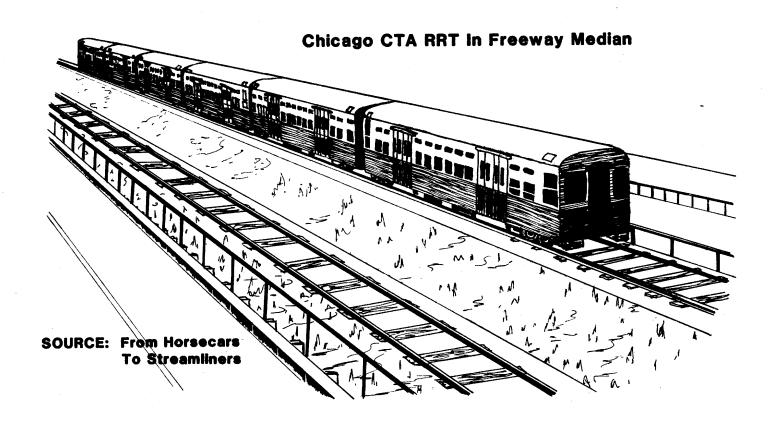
Typical Section of Rail Service Constructed Within a Freeway Median
